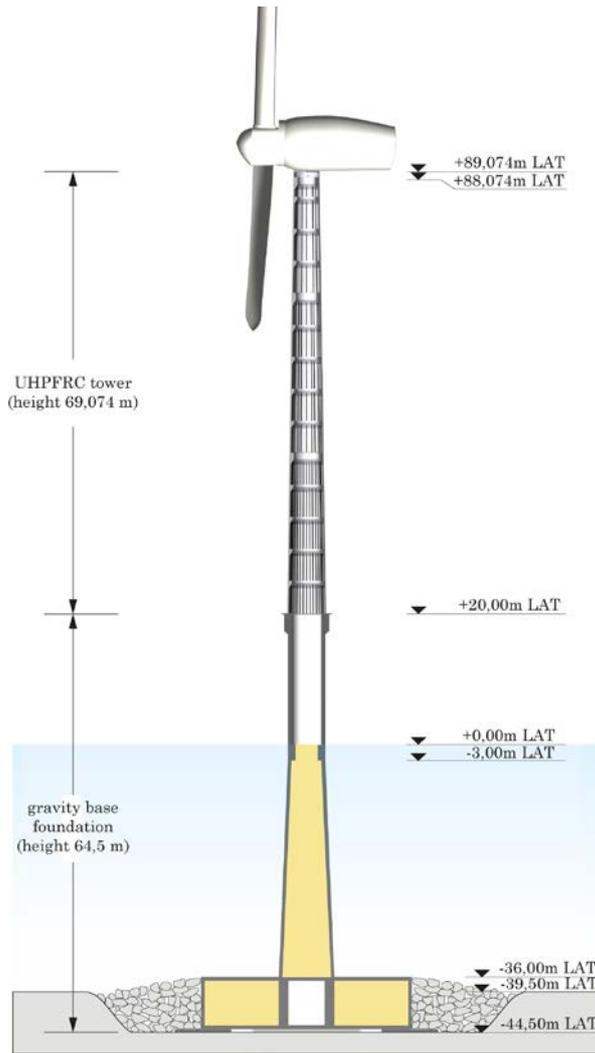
Section of the structure consisting of a gravity base foundation and an UHPFRC tower
